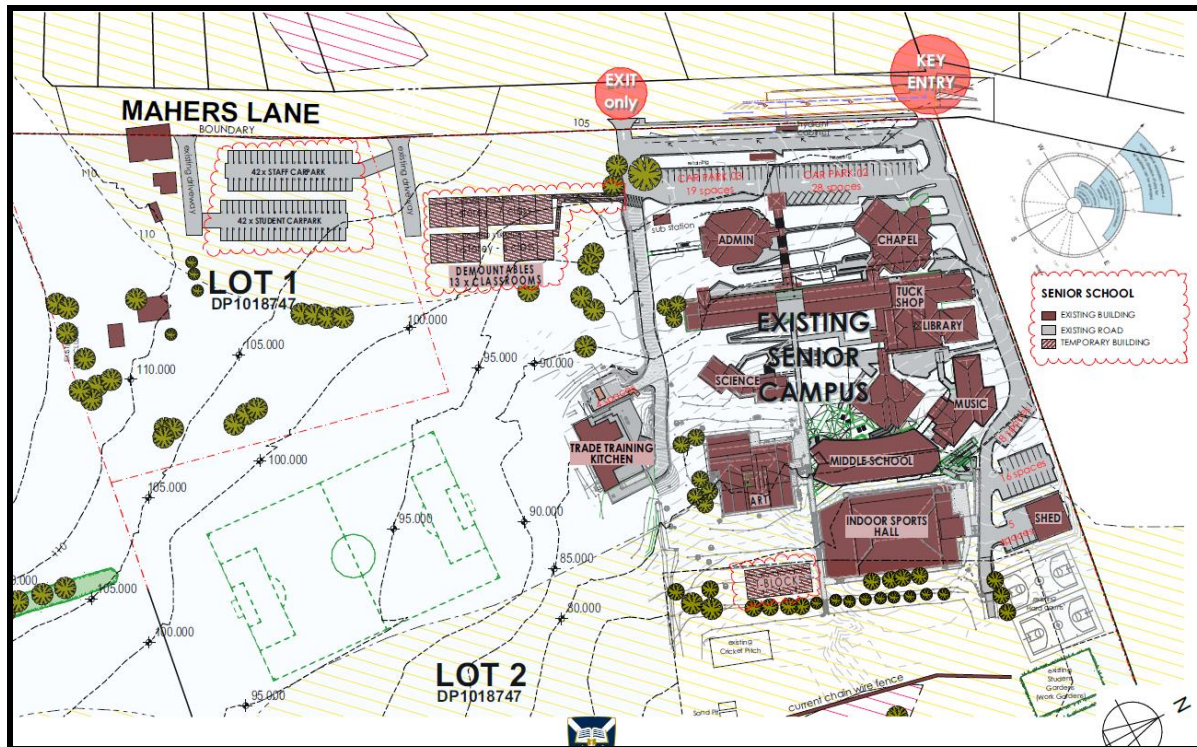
Existing Site Plan (Source: Raunik, March 2023)
